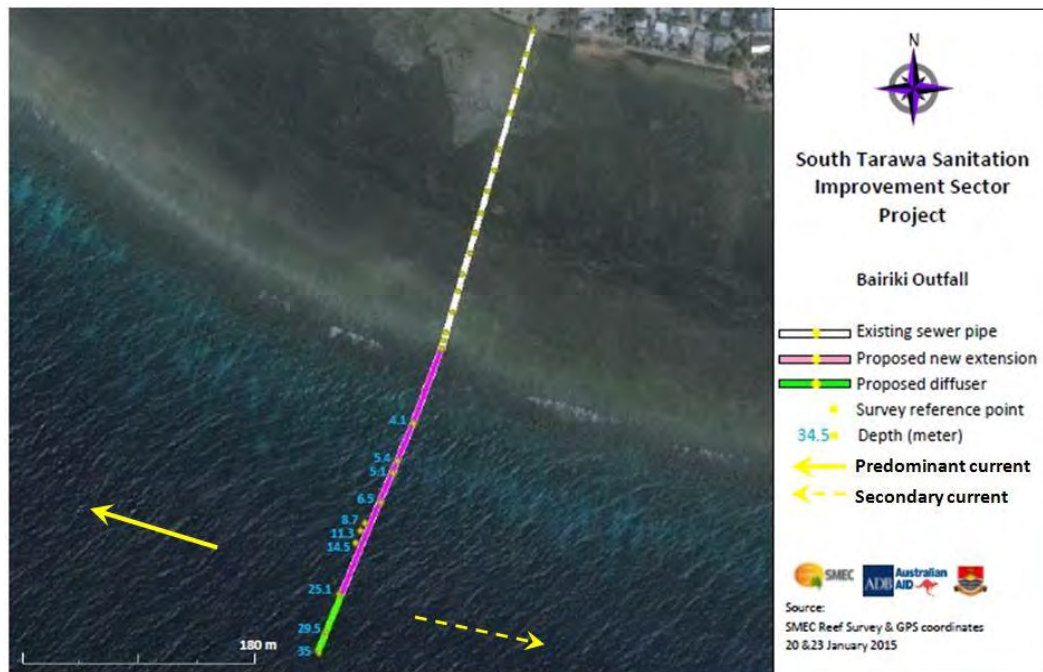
Existing Outfall Pipe and Proposed Extension at Bairiki
